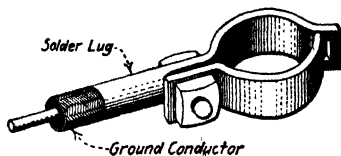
Ground clamp. (*Conduit Electrical Mfg. Co., Boston, Mass.*)
